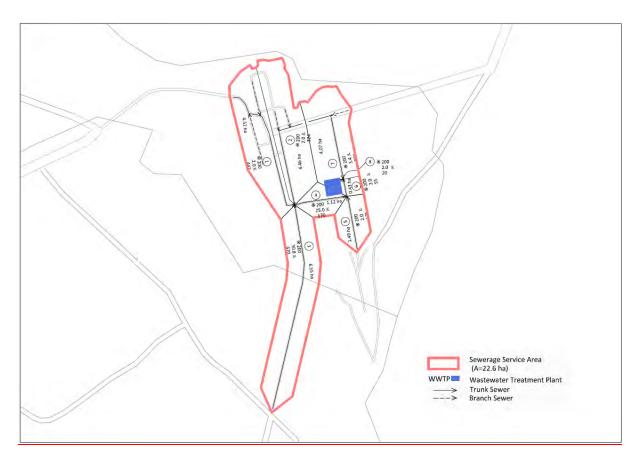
General Layout Plan of Dauis Sewerage System
